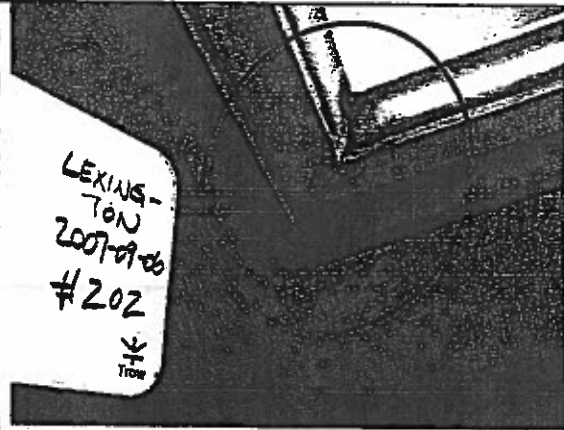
Unit #202 soffit: note water staining on soffit behind trim board indicating gutter joint waterproofing failure.
